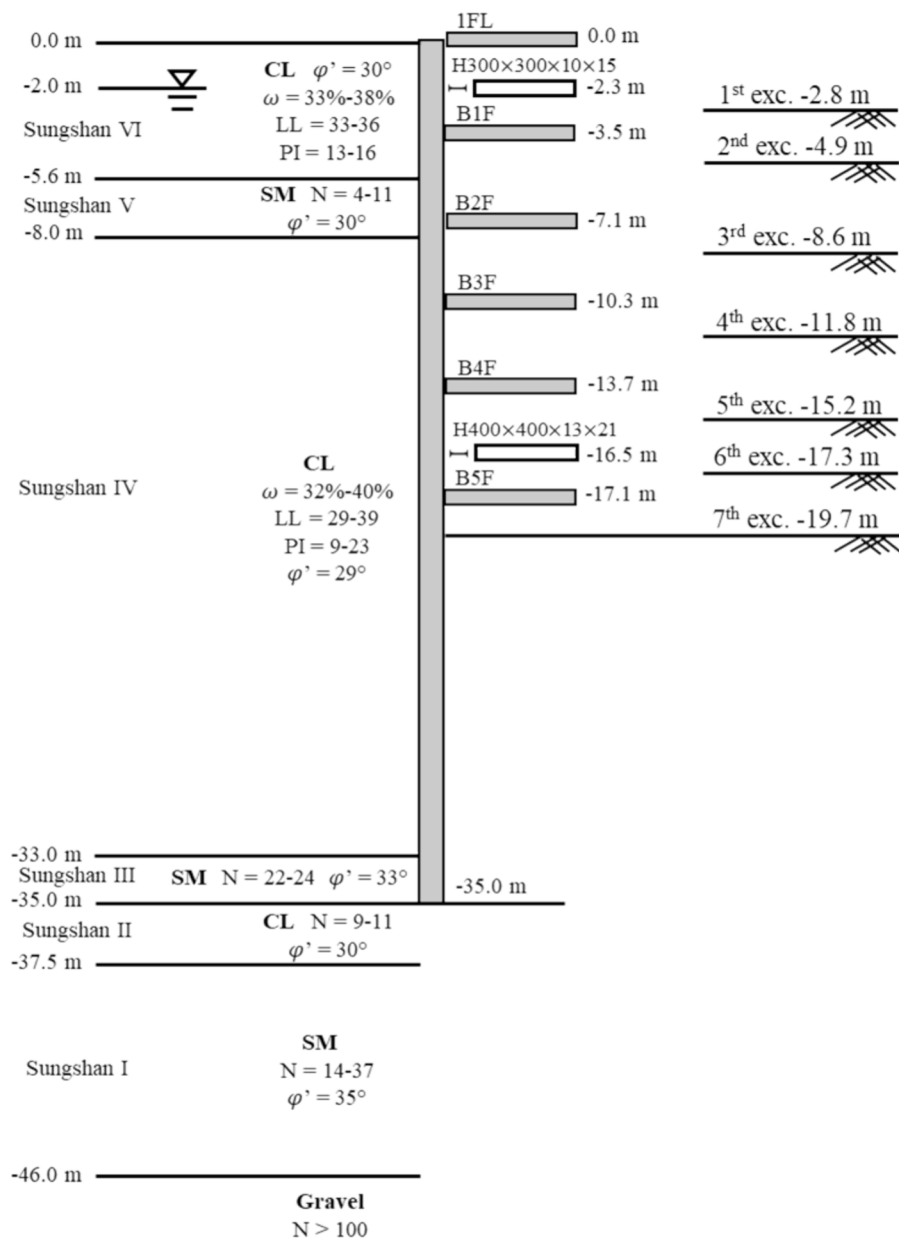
The subsurface soil profile and typical cross-section for deep excavation for TNEC, Taiwan (adapted from Lim and Ou (2017)).
